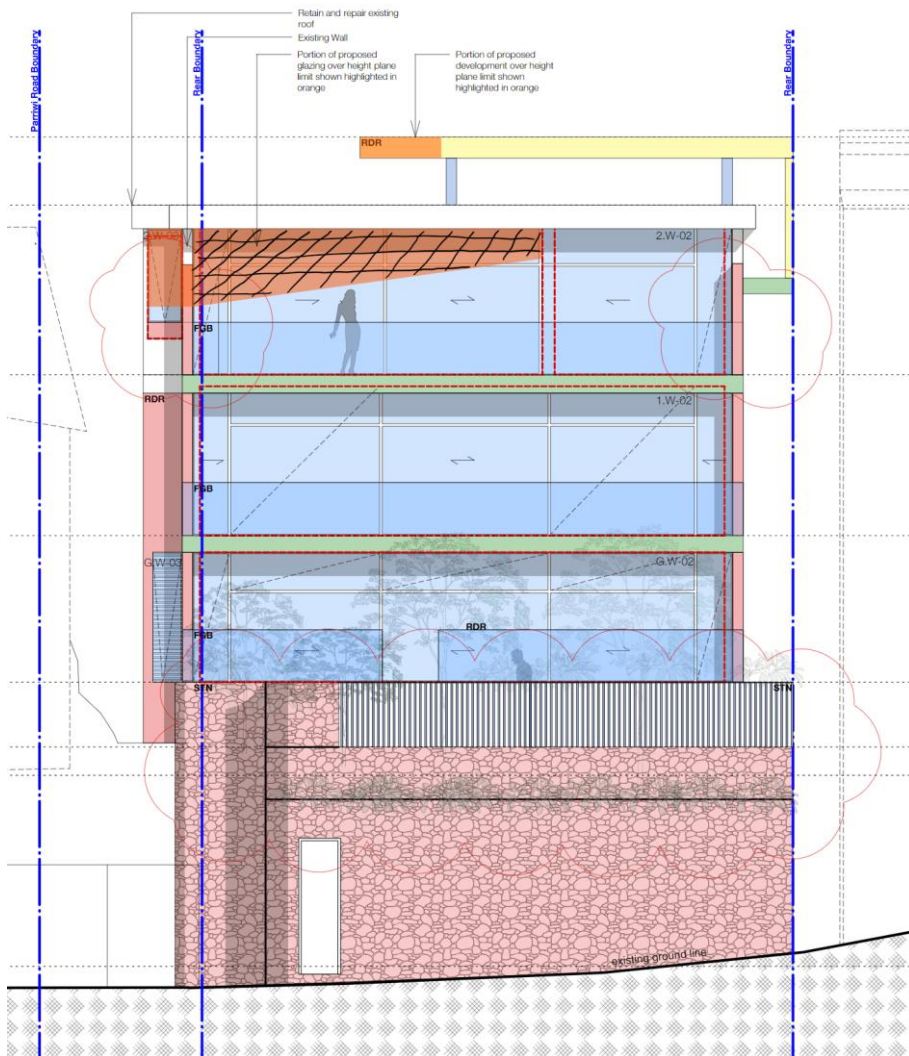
eastern elevation with the area of the re-aligned glazing to the lounge and dining area over the wall height control marked as hatched black
